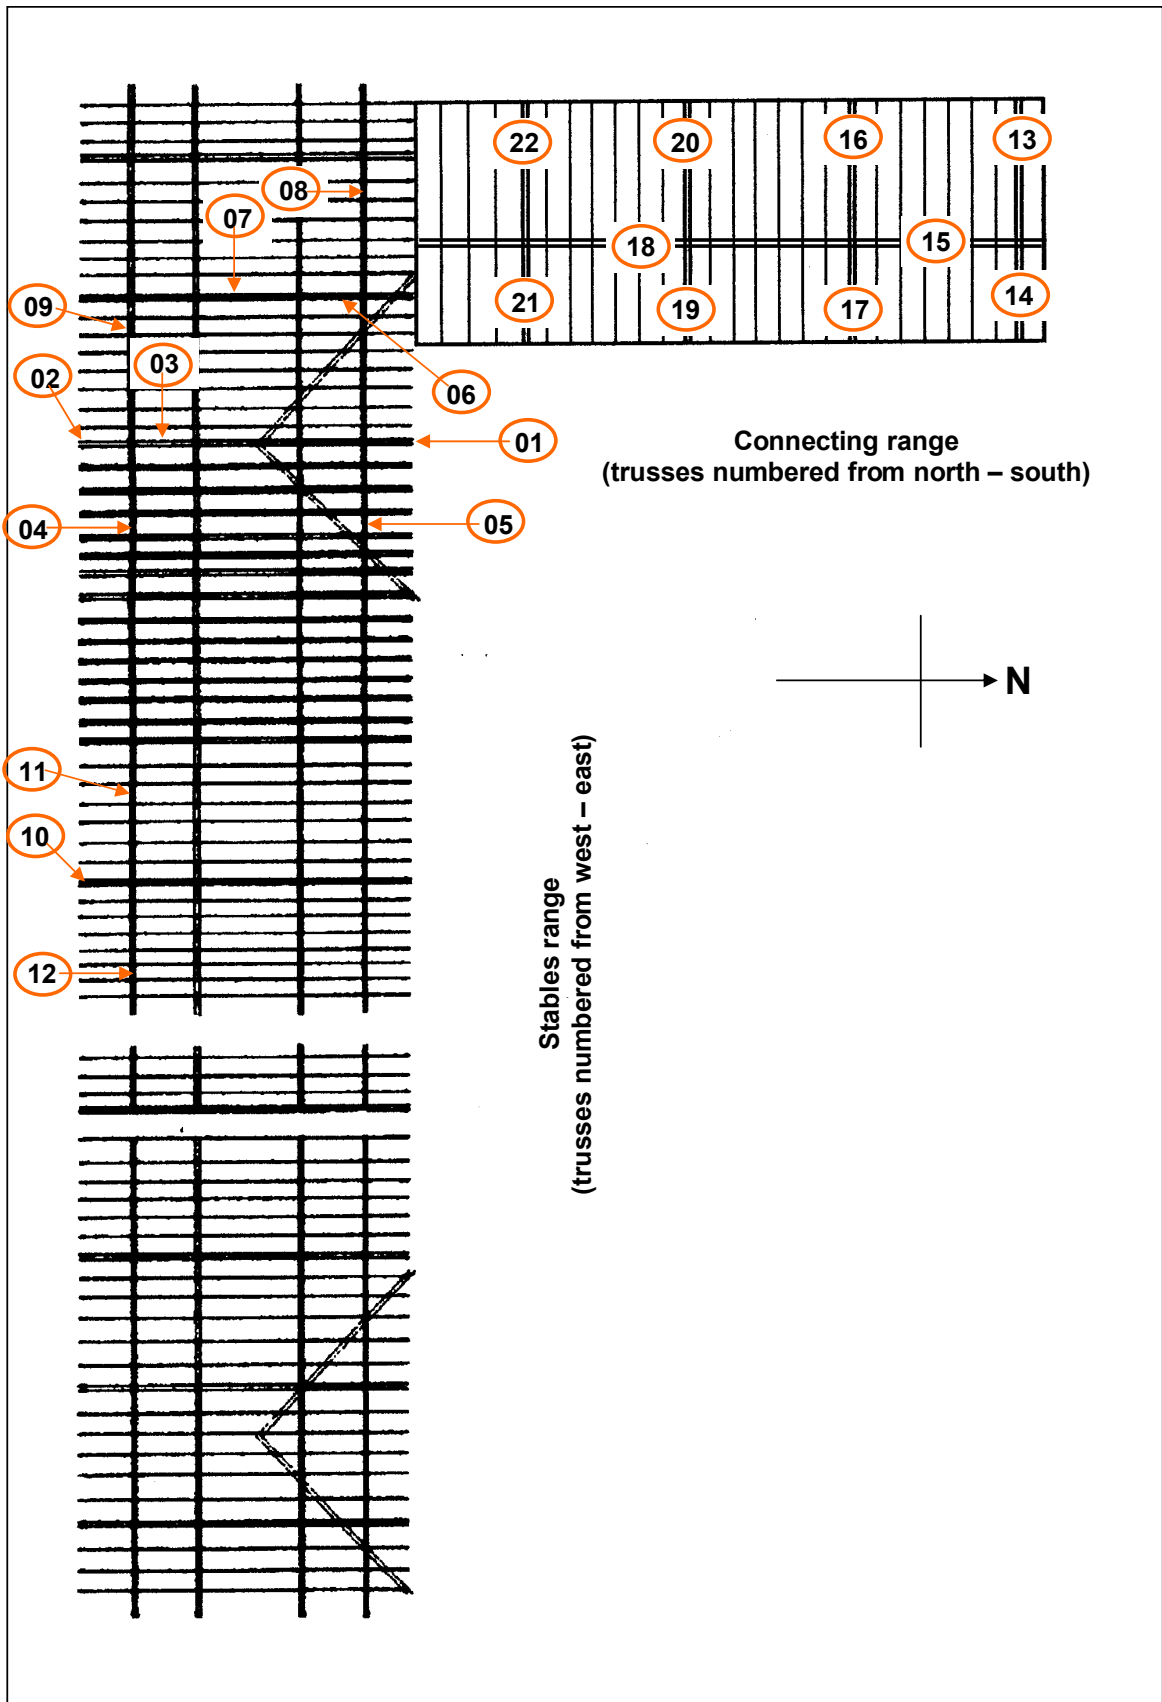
Plan to show location of samples from the roofs of the main and connecting ranges
